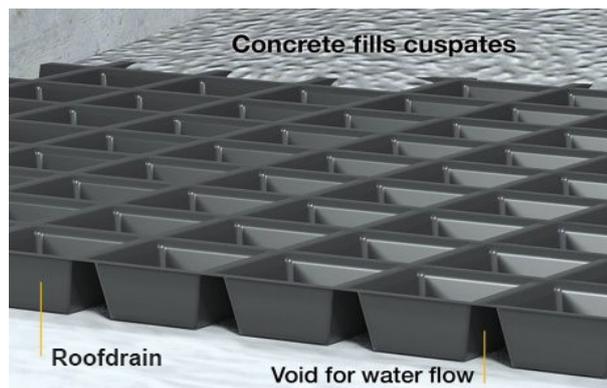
ABG Roofdrain can be filled with mortar for construction of non-load bearing walls and beneath planters.
